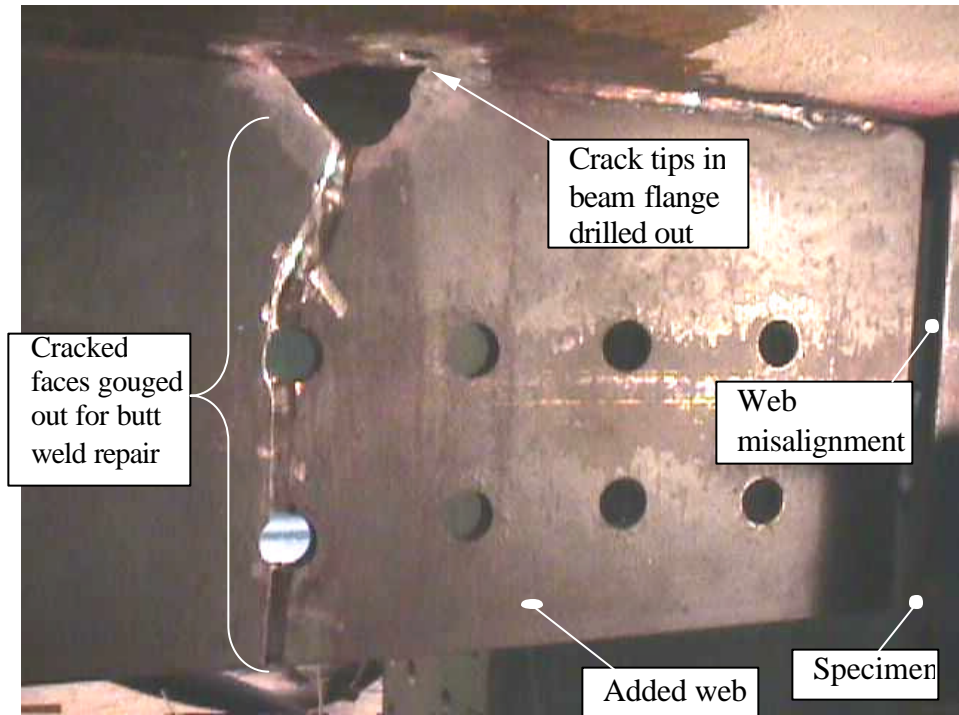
Full view of cracked area prior to weld repair.
